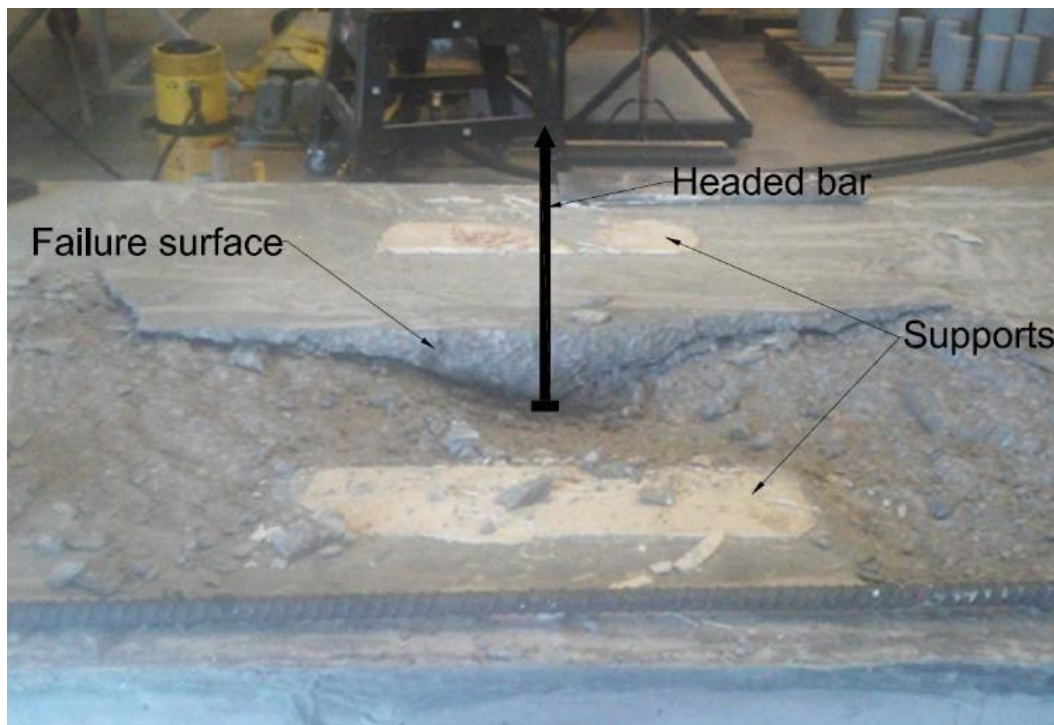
Breakout failure of shallow embedment pullout specimens from Series 6
